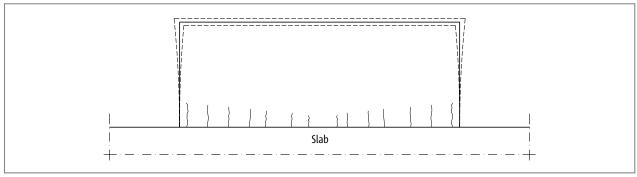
Balcony slab without Schöck Isokorb®: Crack formation through fatigue possible
